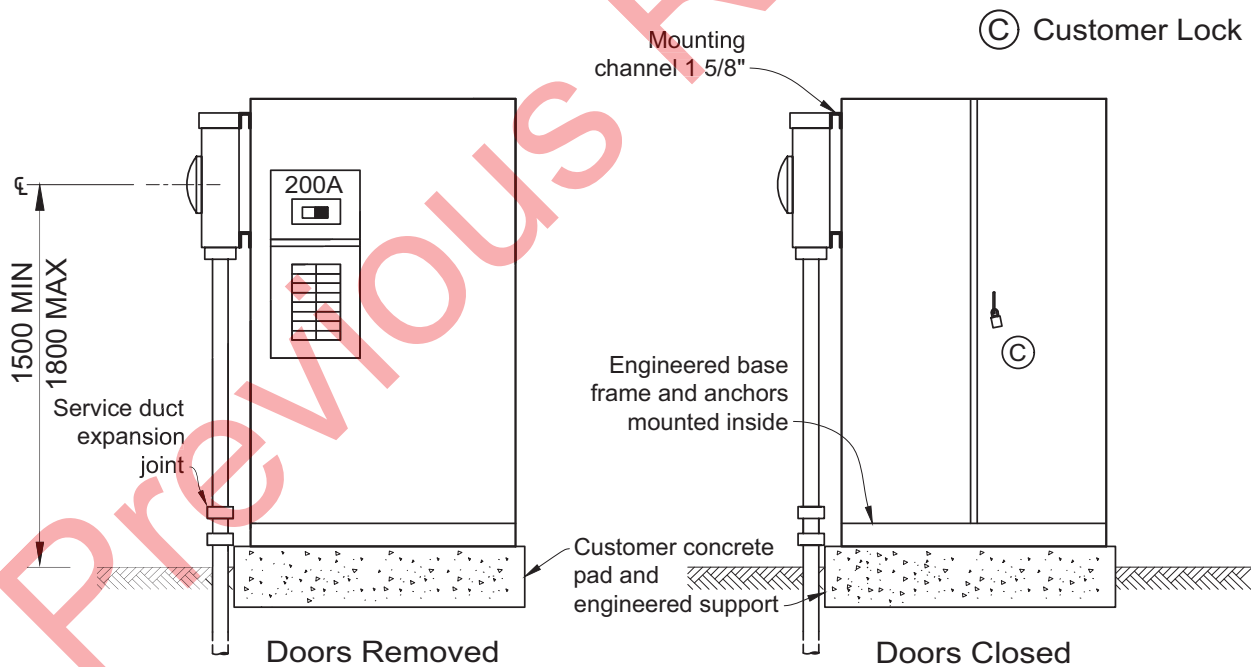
Kiosk with revenue meter socket mounted outside enclosure
